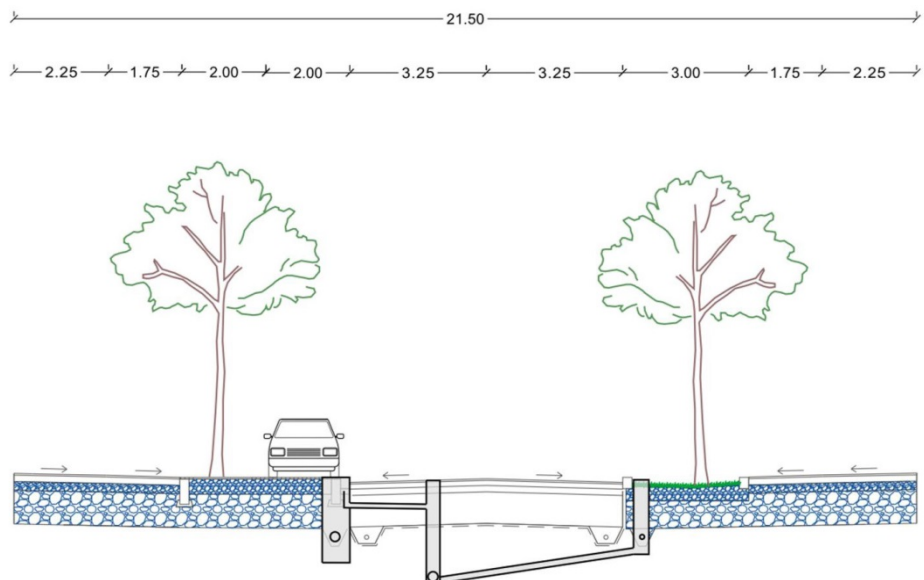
Example on cross section of street Tourukatu (Green Street, Sweco 2016).
